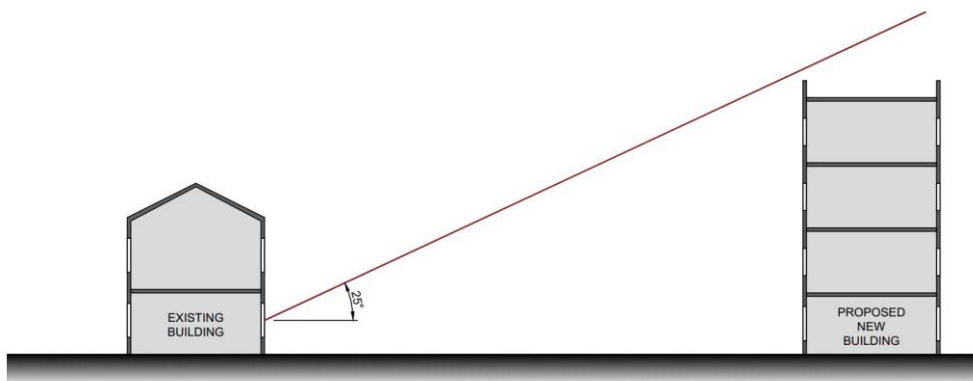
25° Angle test for Daylight Impact to Existing Buildings
